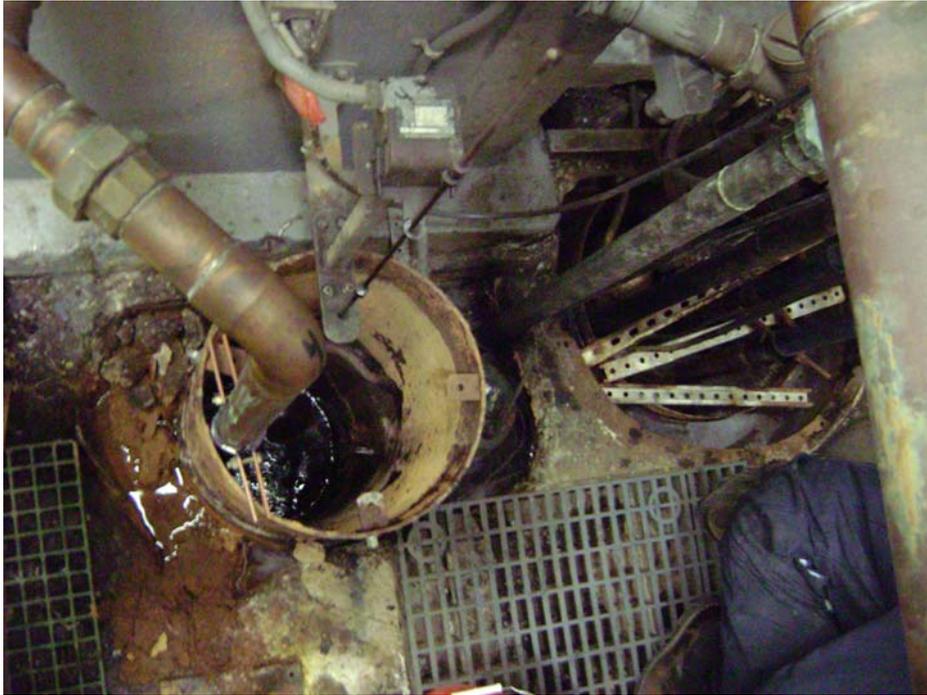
Aerial view of Sump #2 (left) and Sump #1 (right).
